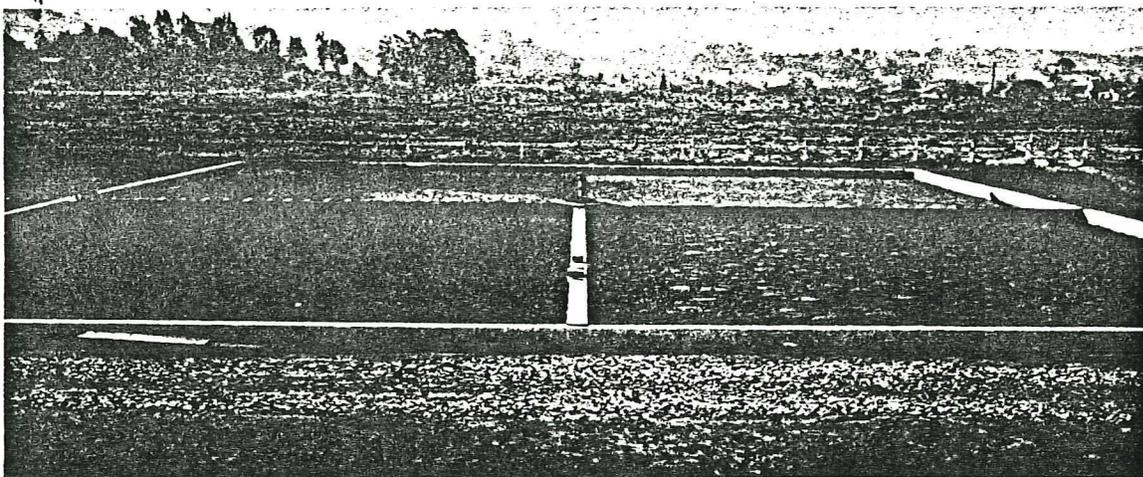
Petaluma Sewage Disposal Plant. Sludge drying beds.
